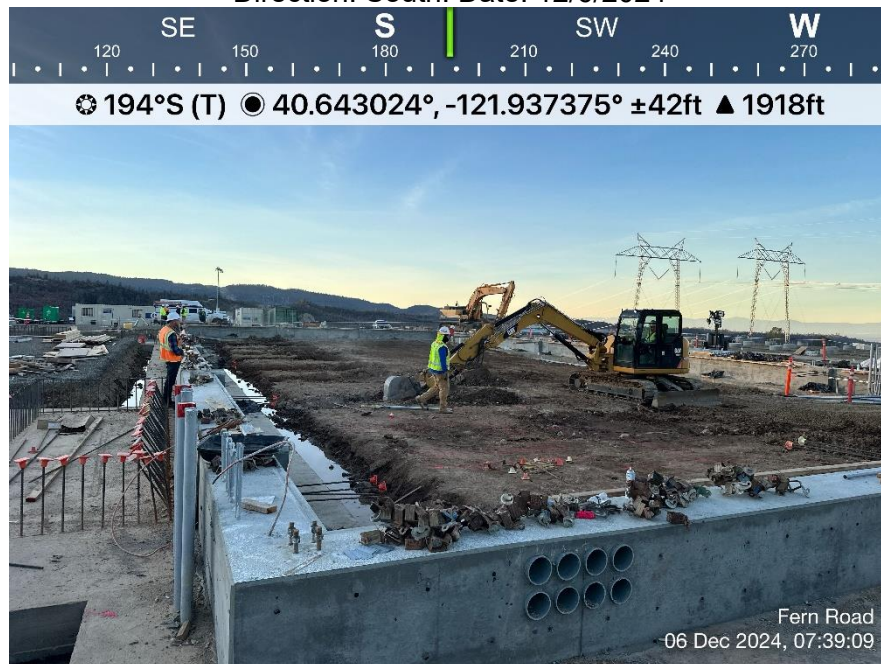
View of TTR crew drilling dead-end pier foundation holes on substation pad.
